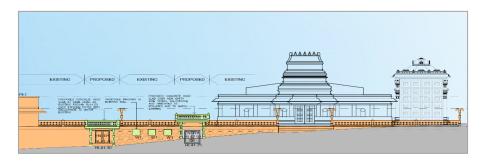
Eastern elevation plan showing proposed development (Extract from Drawing No. A2.005, Rev 4, prepared by JEYA Architects, dated 19/12/2020)
